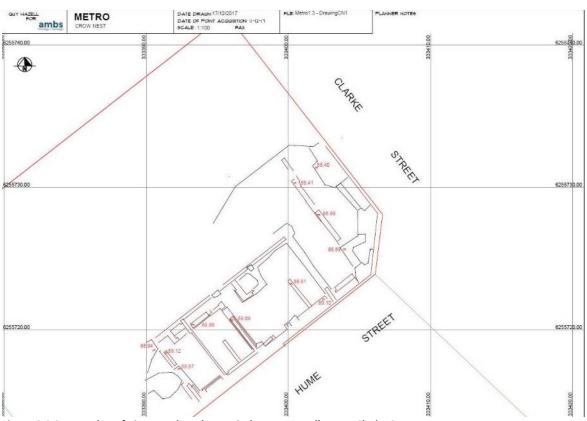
Survey plan of nineteenth and twentieth century walls at 14 Clarke Street.
